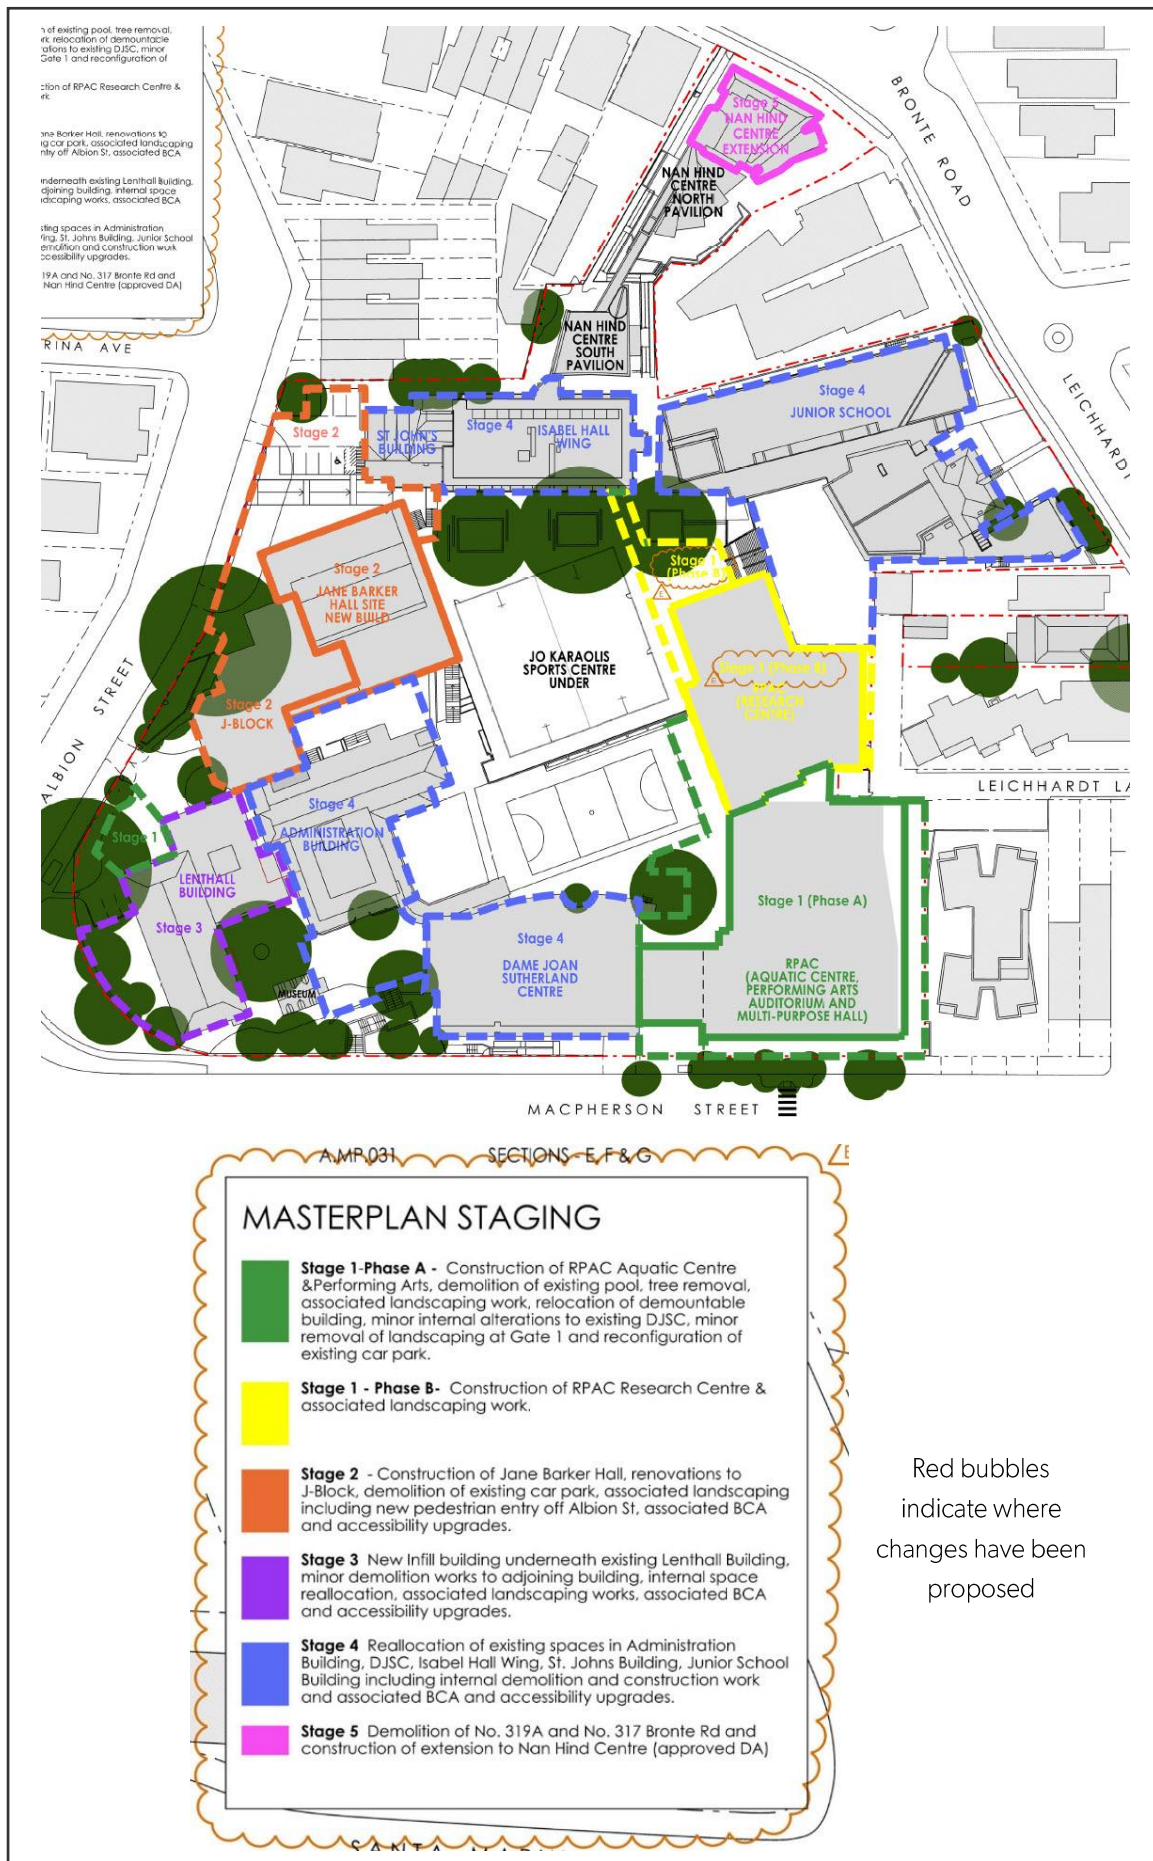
Proposed Staging Masterplan (Source: Applicant's Modification Application 2019)
